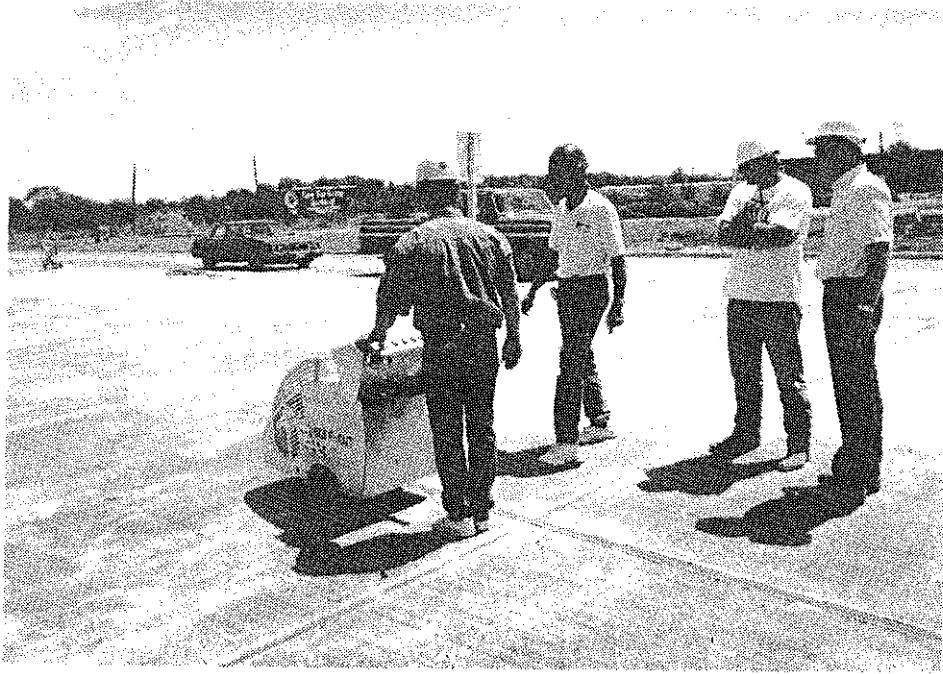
Soft-Cut Early Sawcutting Machine.
